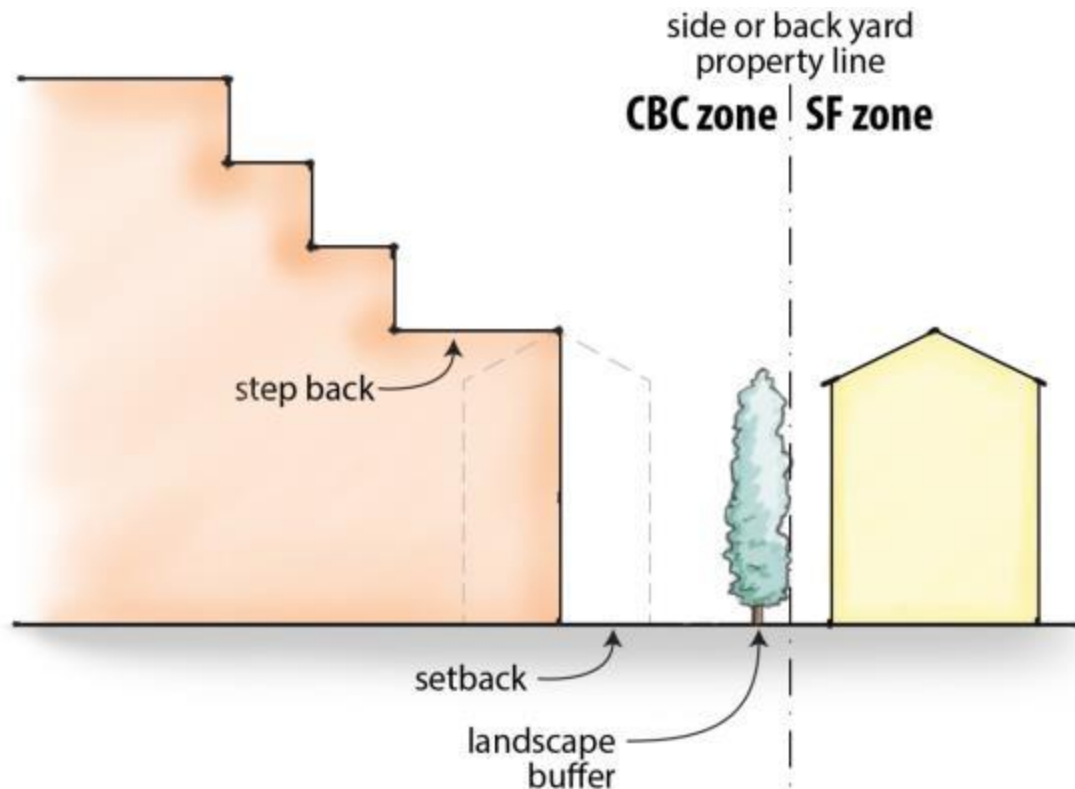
F.1 Building Step Back and Setback Examples
